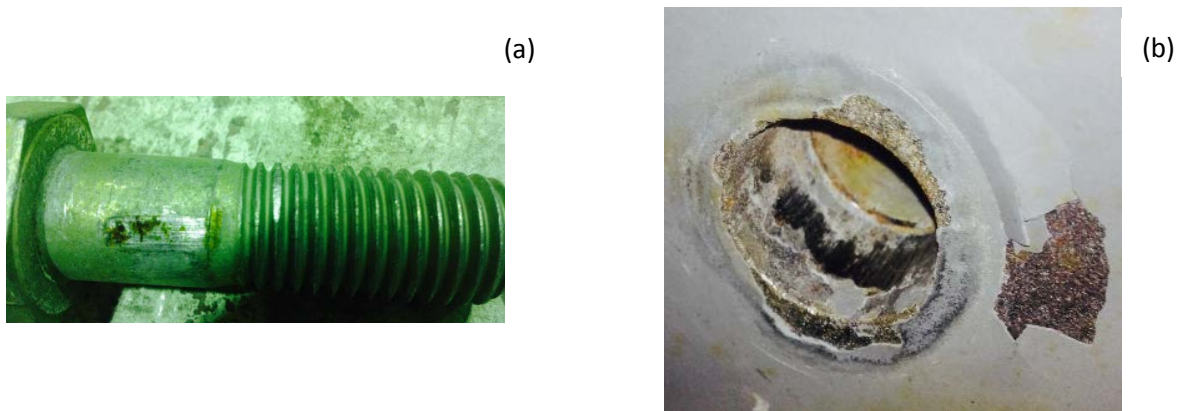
Typical surface damage on a (a) bolt and (b) gusset plate bolt-hole
